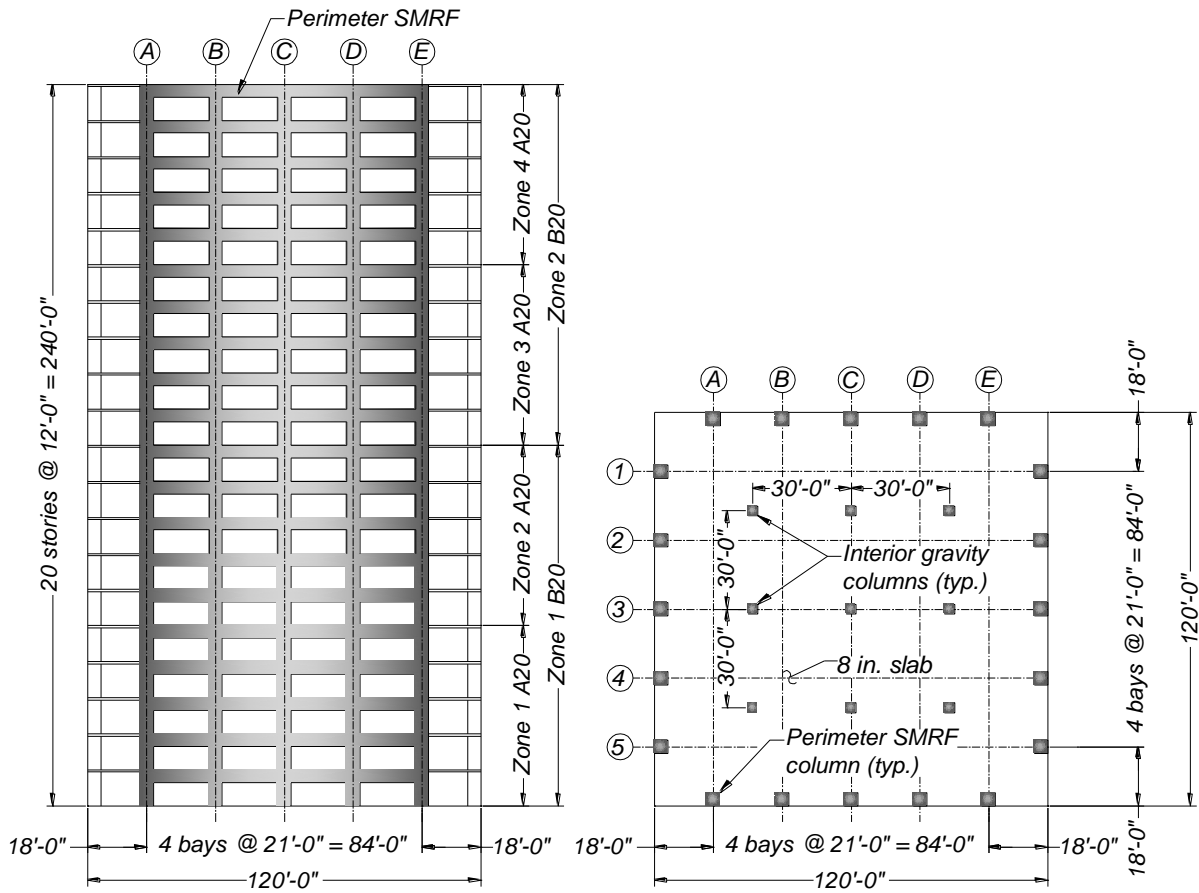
(Left) Elevation and (Right) floor plan of buildings considered.
